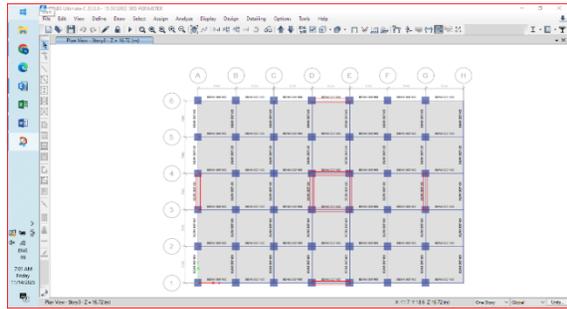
shows the plan view of the building model where flag walls are provided along the perimeter of the structure
